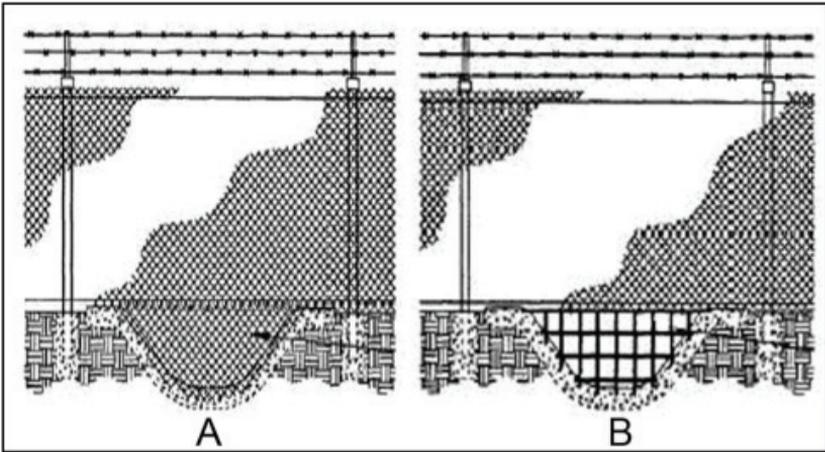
Under-fence utility openings. A: Swale crossing with ground stakes; B: Bar grill embedded in concrete. (MIL-HDBK-1013/10)
